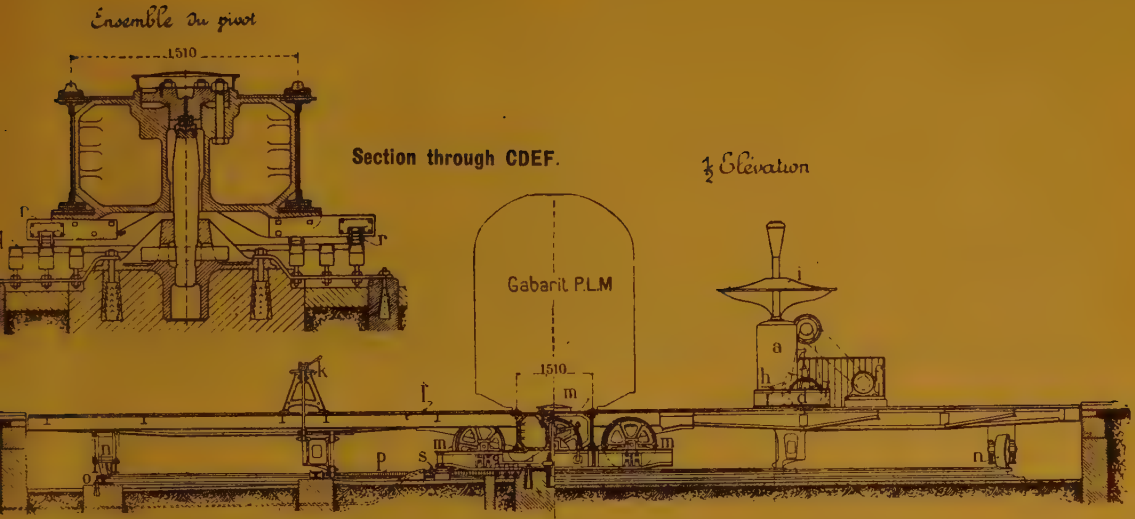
(continued). — 21 m. (68 ft. 10 $\frac{3}{4}$ in.) covered turntable with gear drive.
